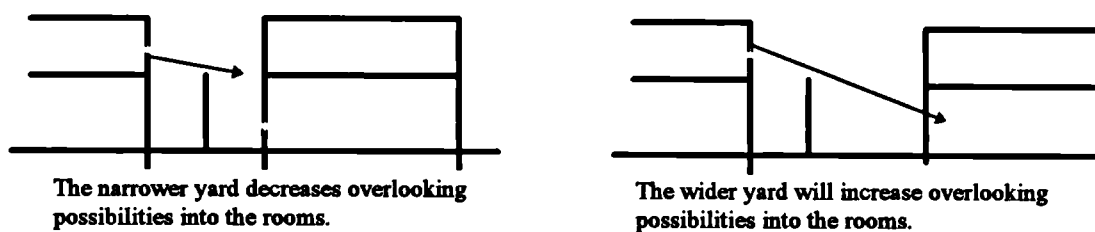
The effect of yard width on the overlooking of rooms located on the ground floor through windows.
